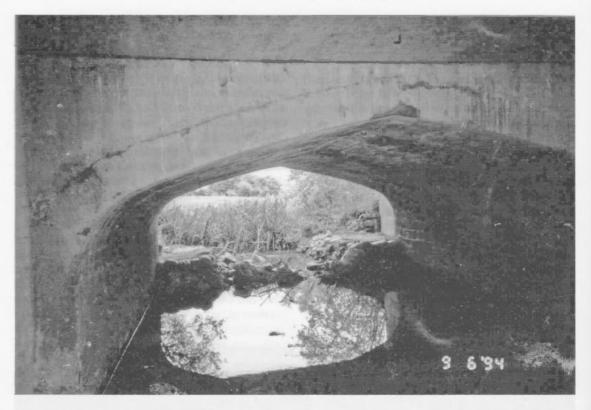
The arch of Hardwick bridge facing upstream. The lowest part of the reinforced platform lying on top of the bridge and also on side abutments are discernible. September 1994
